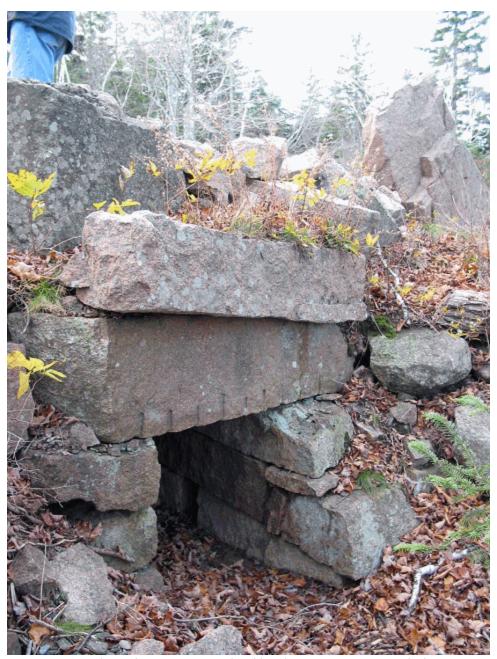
Stone box culverts are among the oldest drainage structures on the historic motor road system. This picture shows the stone work of an outlet on Cadillac Mountain Road. (Acad0013_0.920_Out, OCLP 2005)
